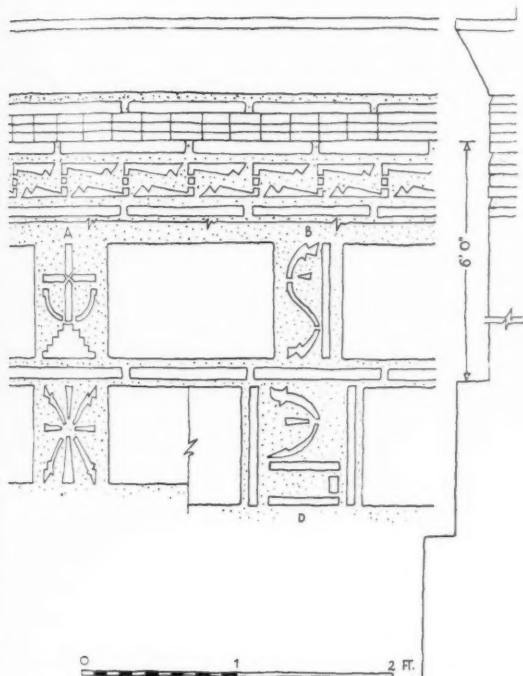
CHONICA, APSE BRICKWORK DETAIL BELOW CILL
